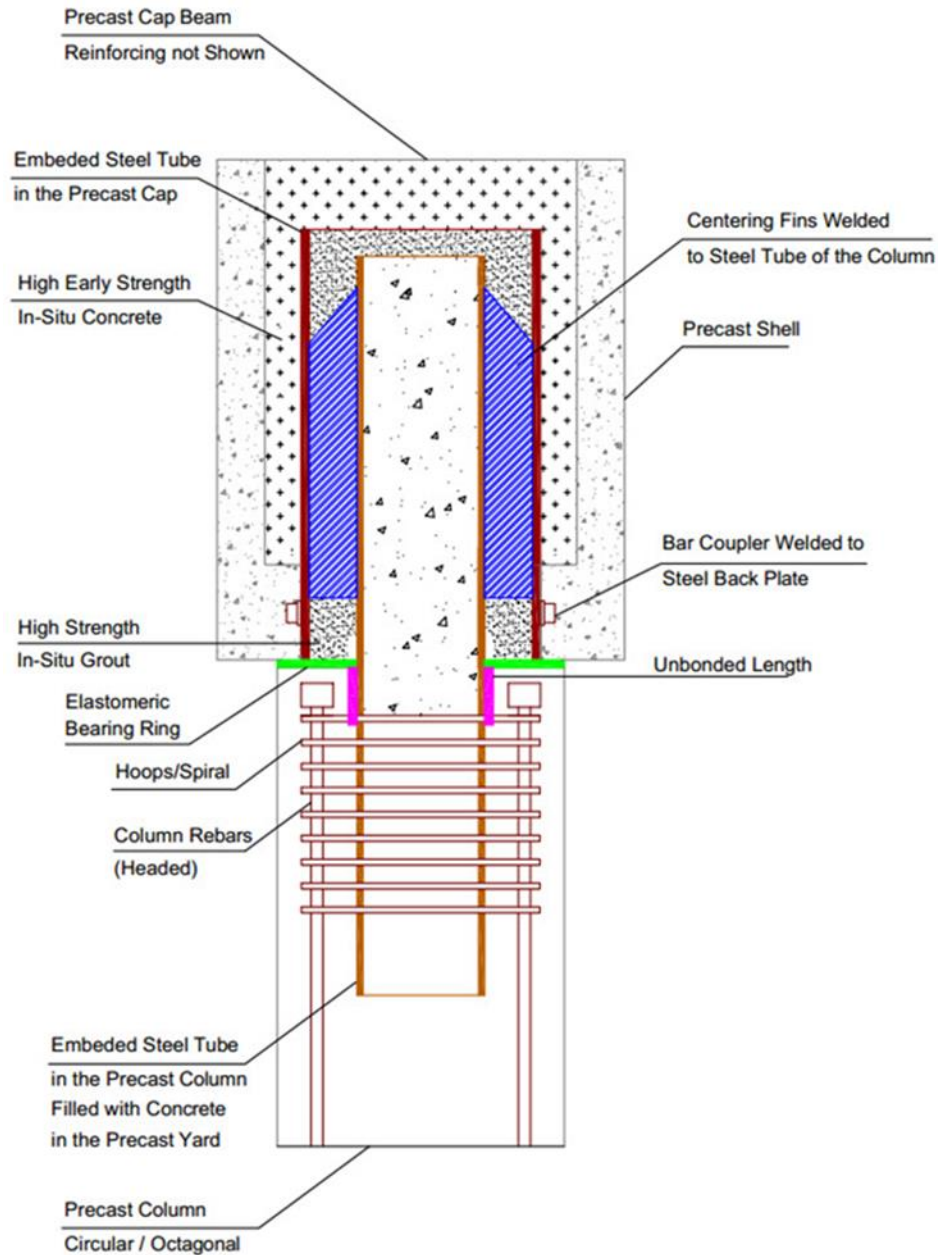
Proposed Connection: Pier-to-Cap Connection
